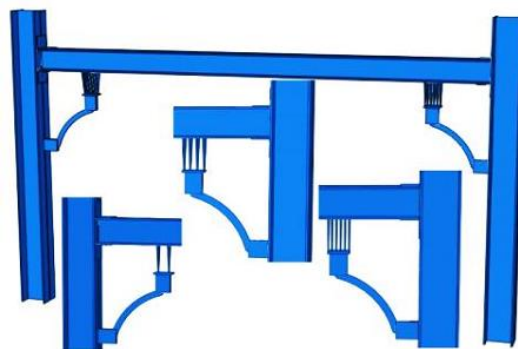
Geometric properties of the studied frames and position of the damper in the beam-to-column connection
